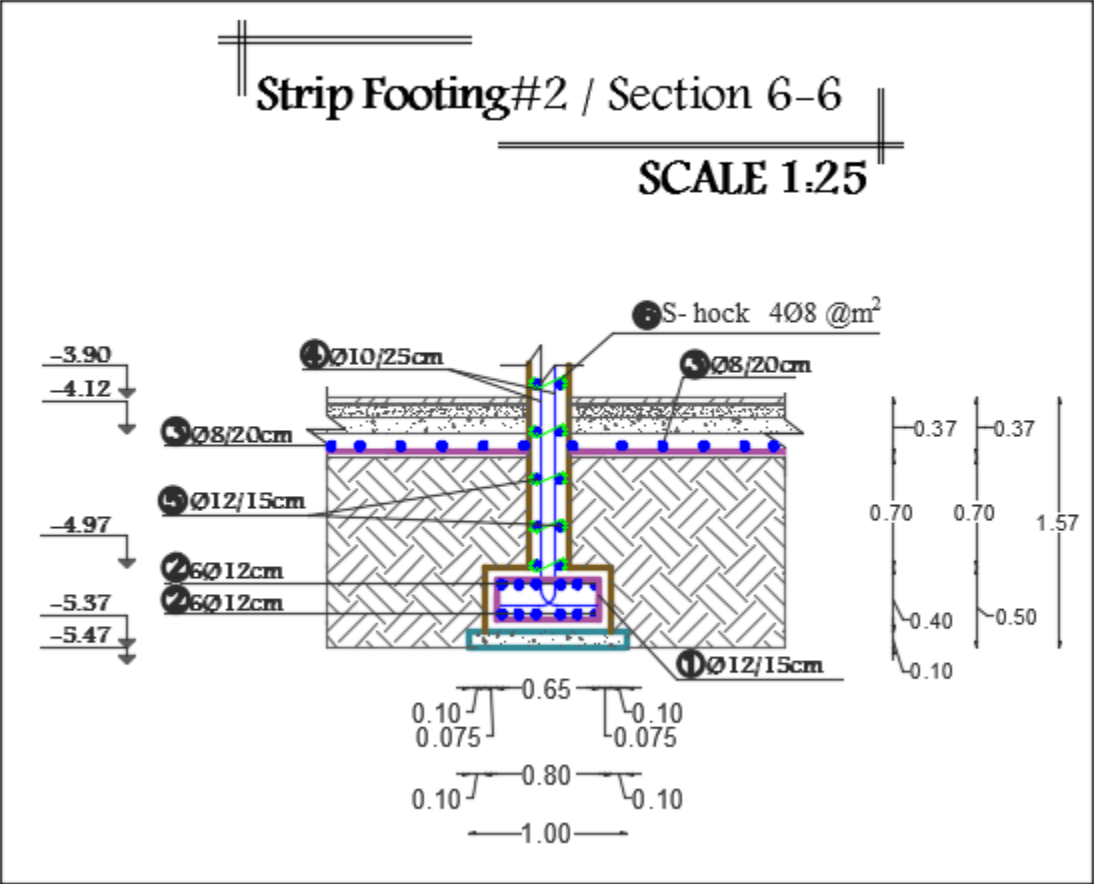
22): Basement wall And Its Strip Footing Reinforcement Details
